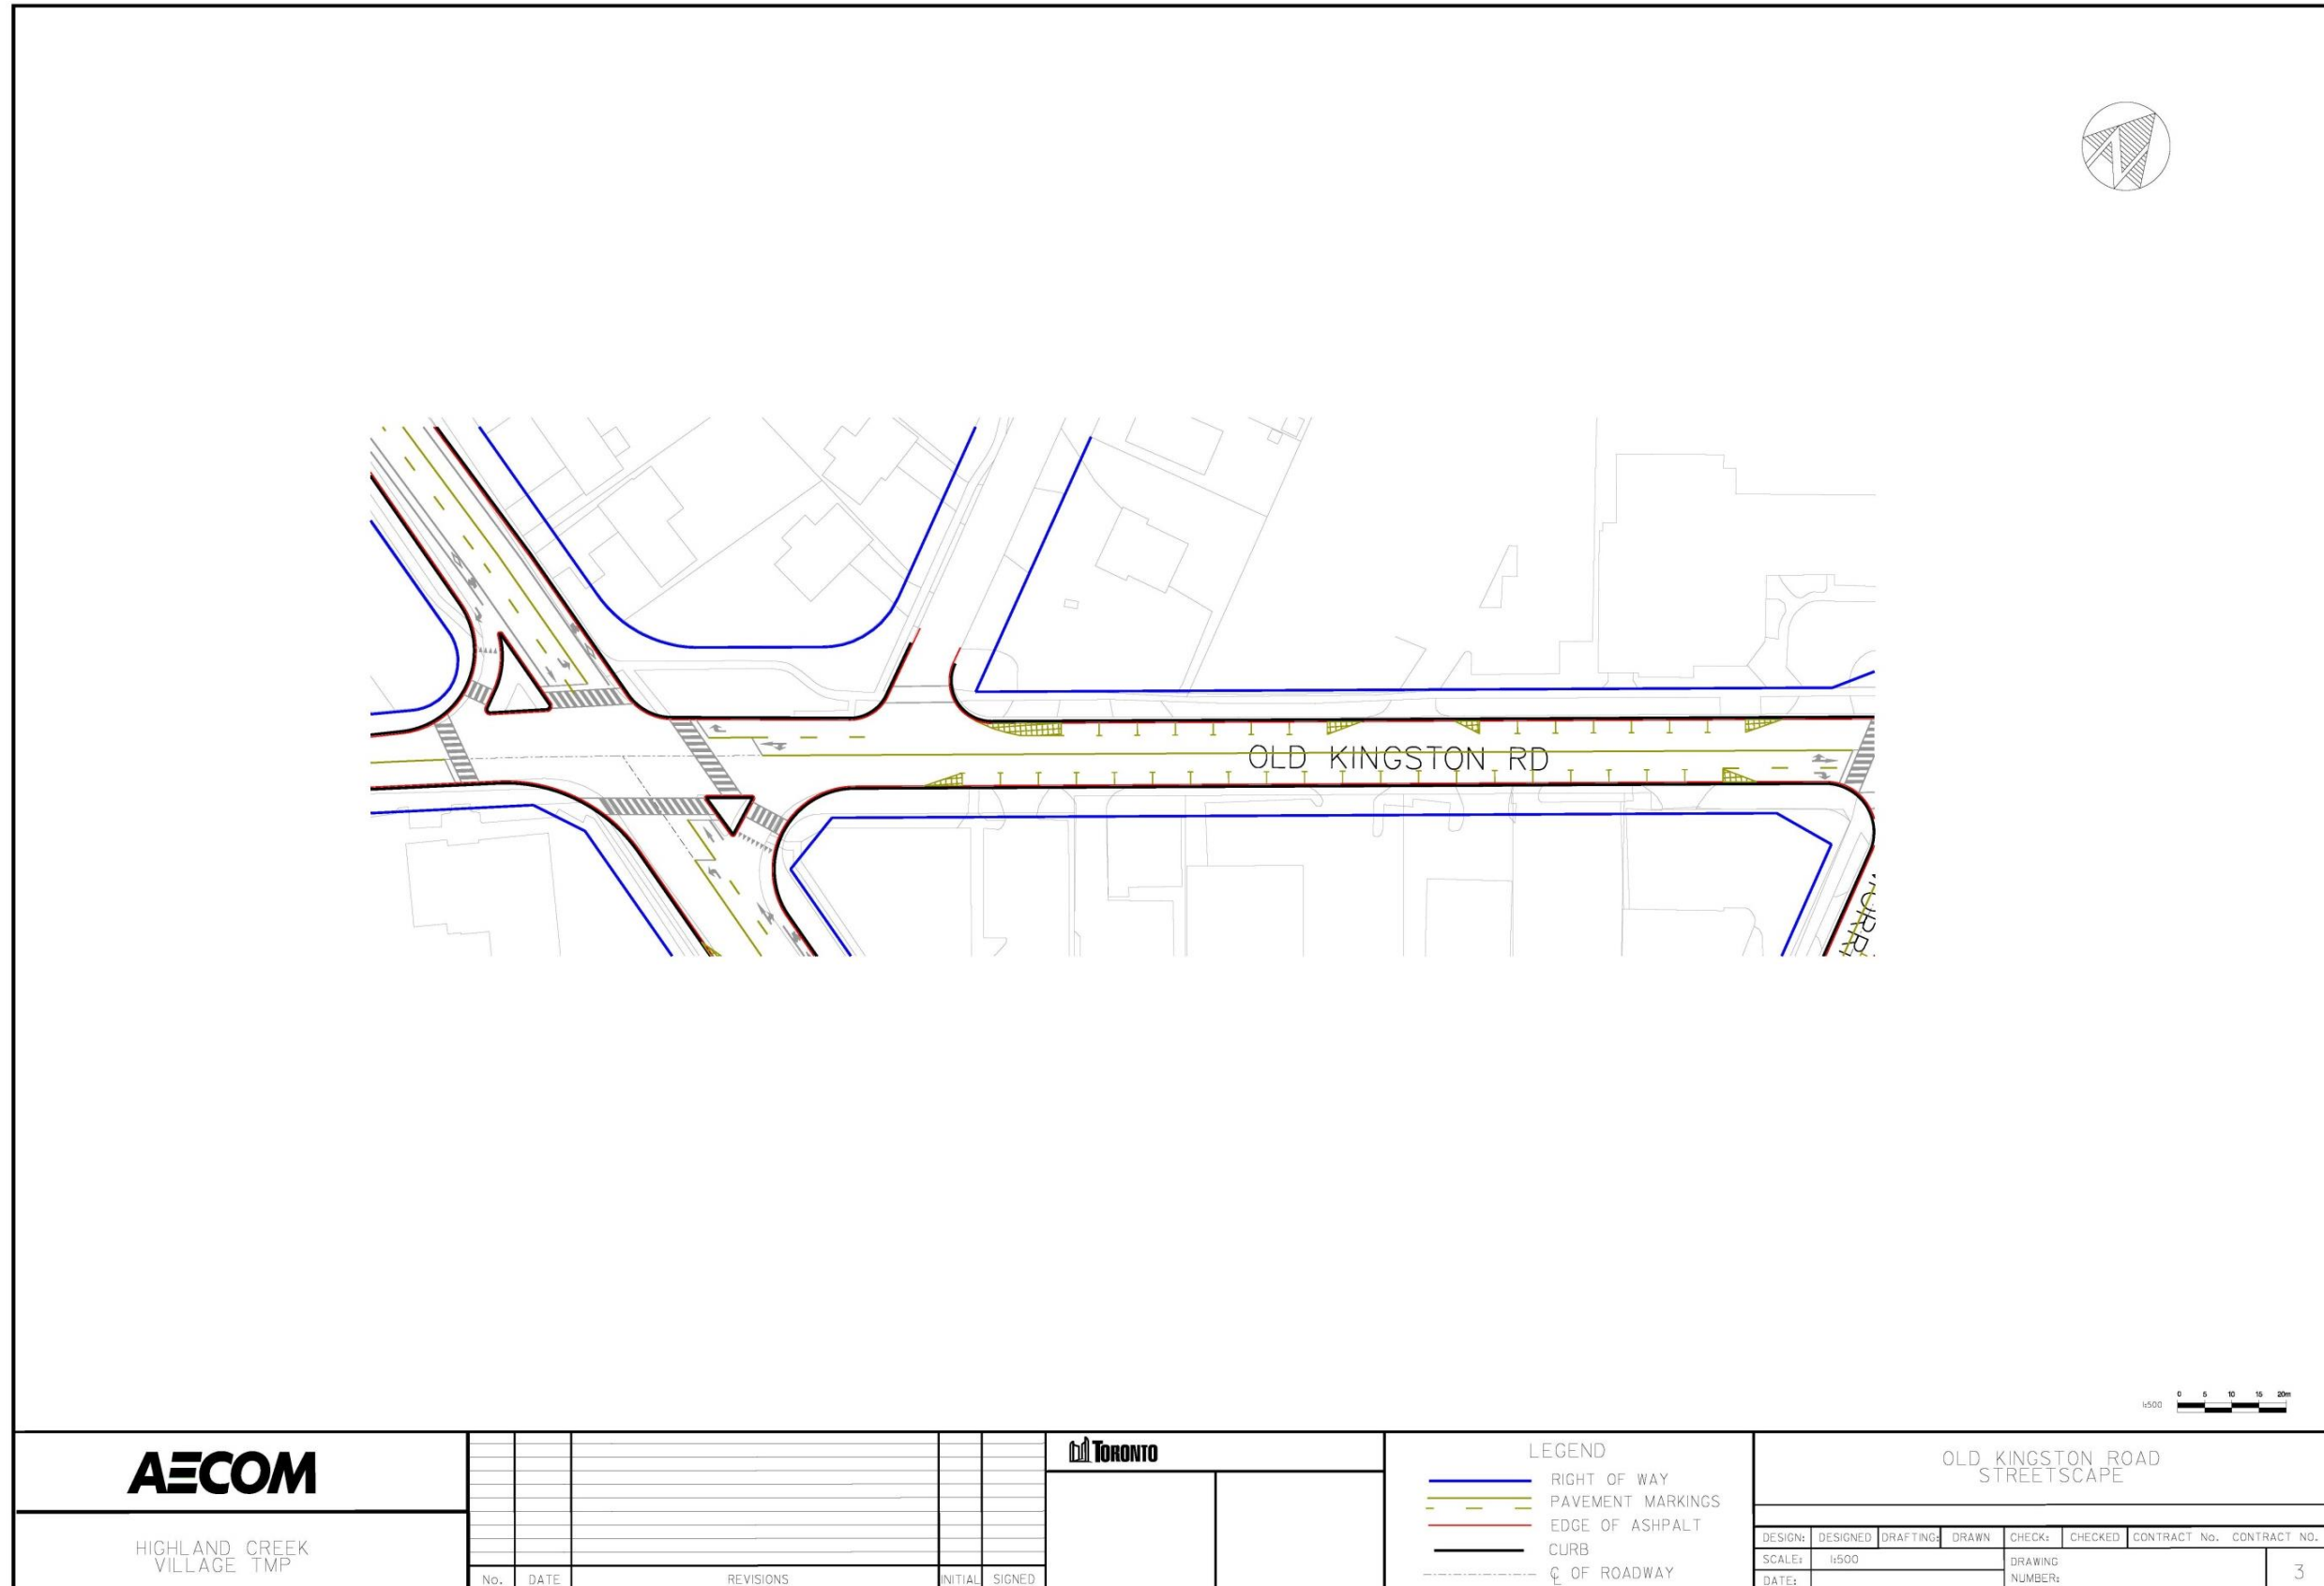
Urban Design Plan for Schedule A+ Project: Old Kingston Road Streetscape
